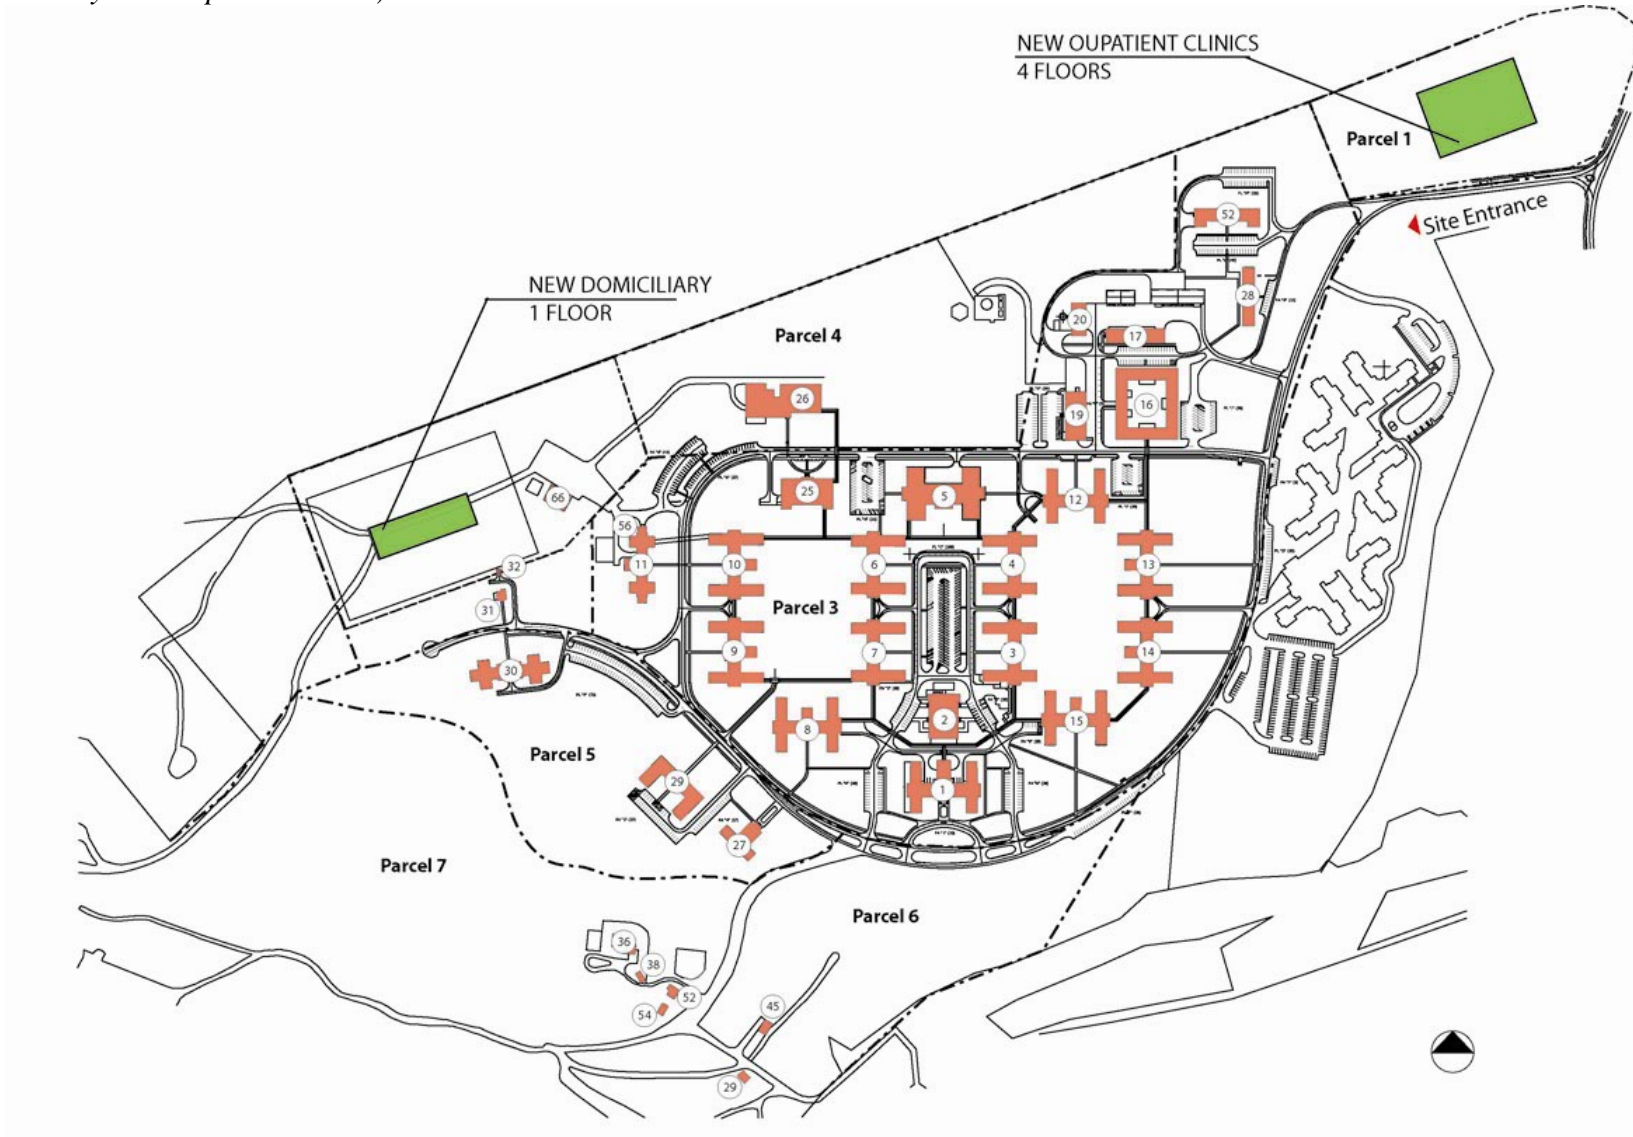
Proposed New Site Plan - BPO 7 (At Castle Point, Construct All New Facilities West of Existing Buildings)
